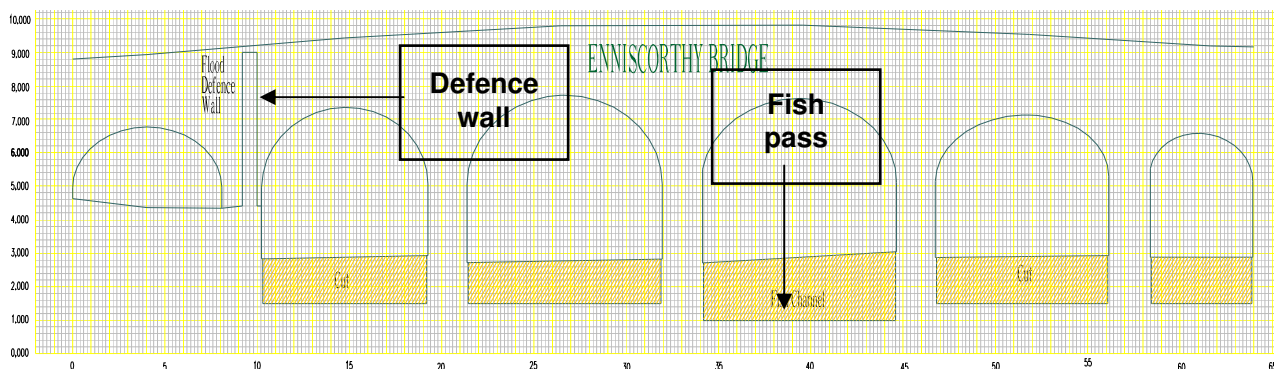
River Widening and Infill between Railway Bridge to downstream of Enniscorthy Bridge
